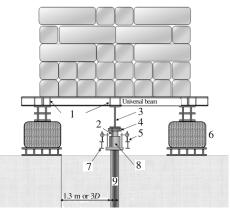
Typical arrangement for a Maintained Load Test (MLT): 1) stiffeners; 2) load cell; 3) girder; 4) steel cleat; 5) dial gauge; 6) concrete block; 7) reference beam; 8) hydraulic jack; 9) test pile.
